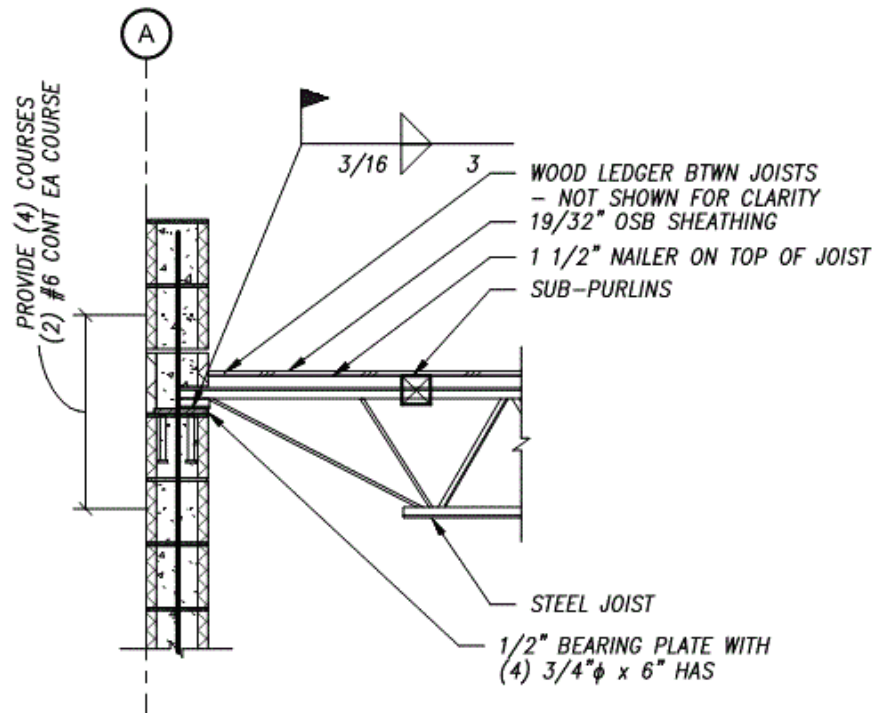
Single-story retail/industrial/warehouse building framing detail.
